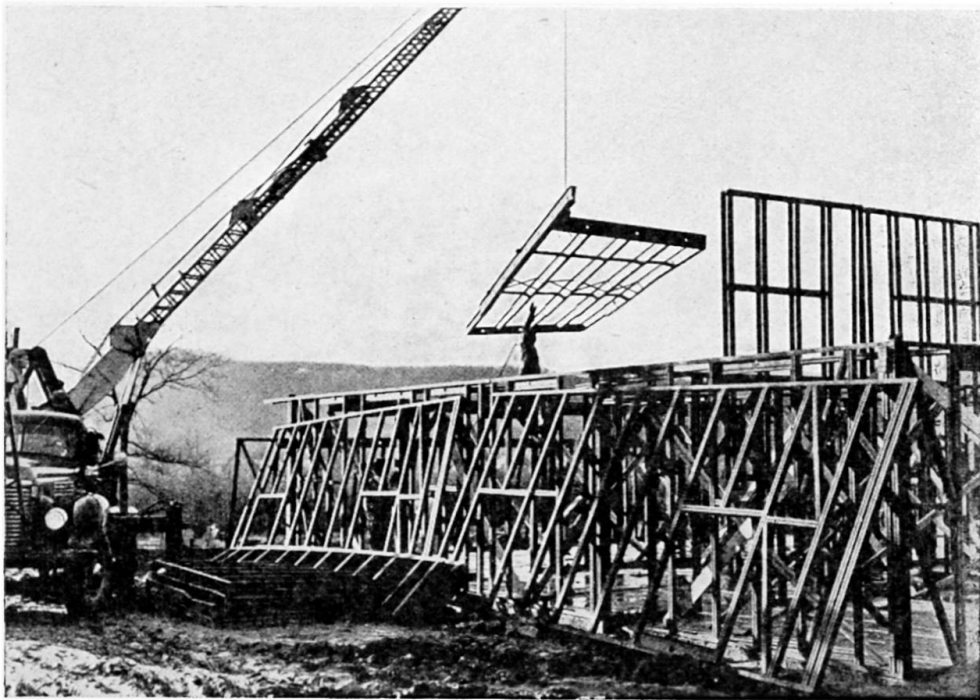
Erection of prefabricated wall and floor panels for two-storey apartment houses (Stran Steel Division, Great Lakes Steel Corp.)
